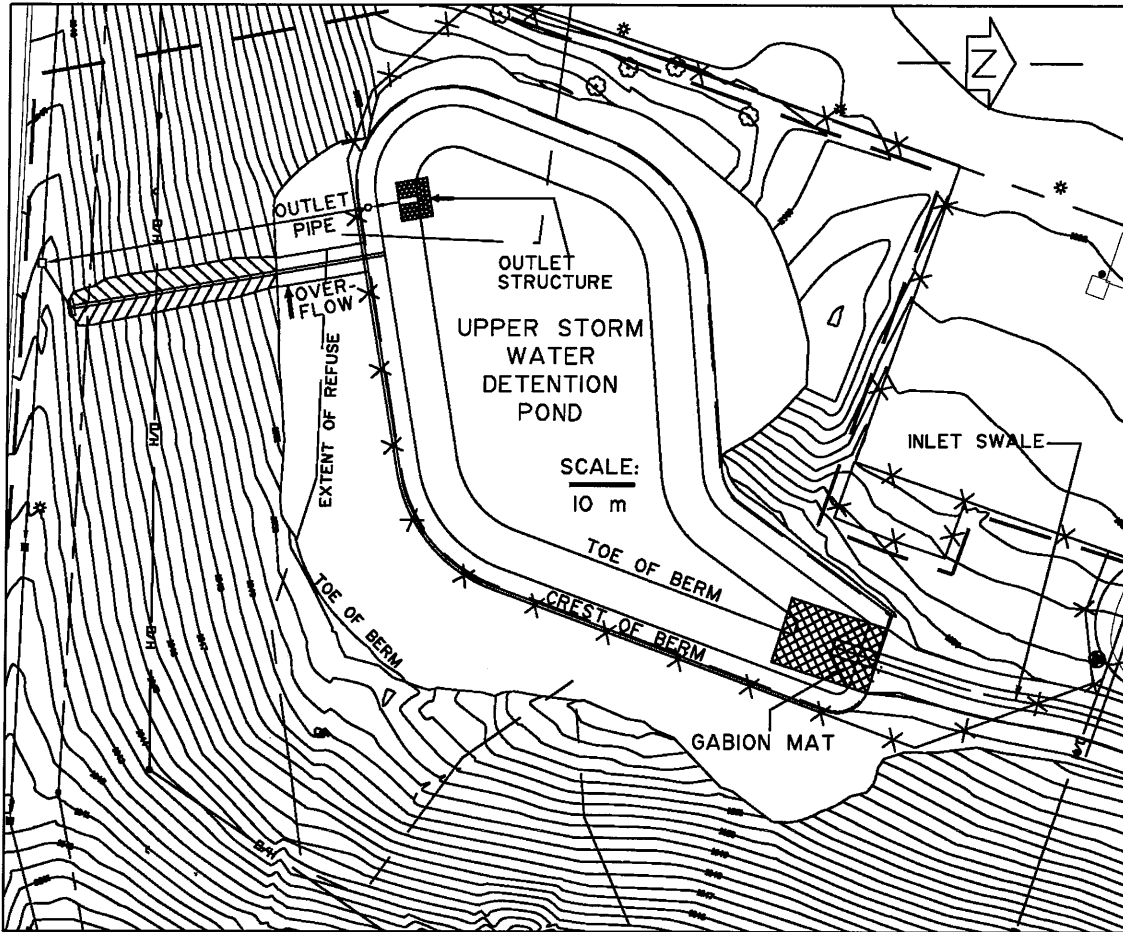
Typical detail of Blackfoot Landfill upper storm water detention pond liner.
